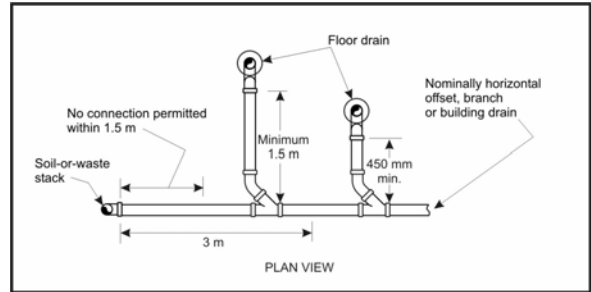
(6) Soil-or-Waste Pipe Connections.”;
